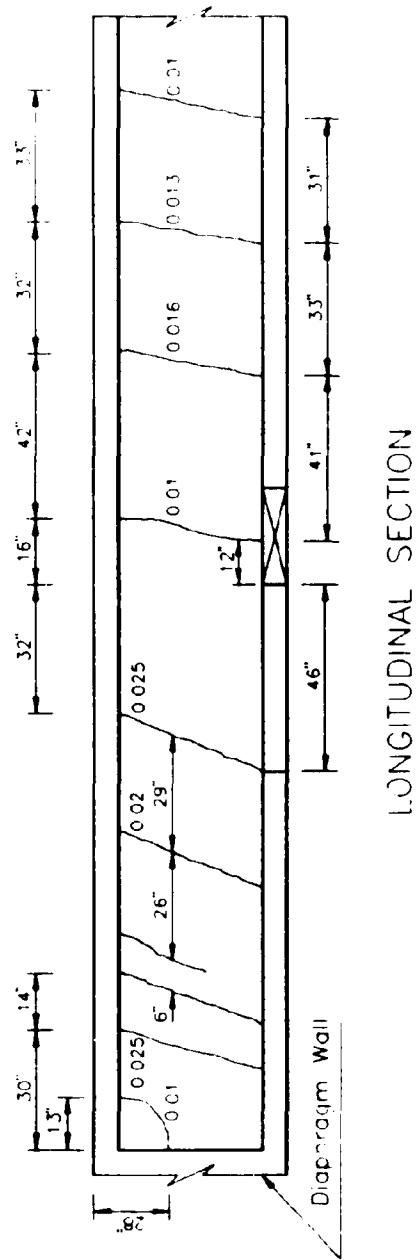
Girder and Bottom Slab Cracks in the South Girder.
